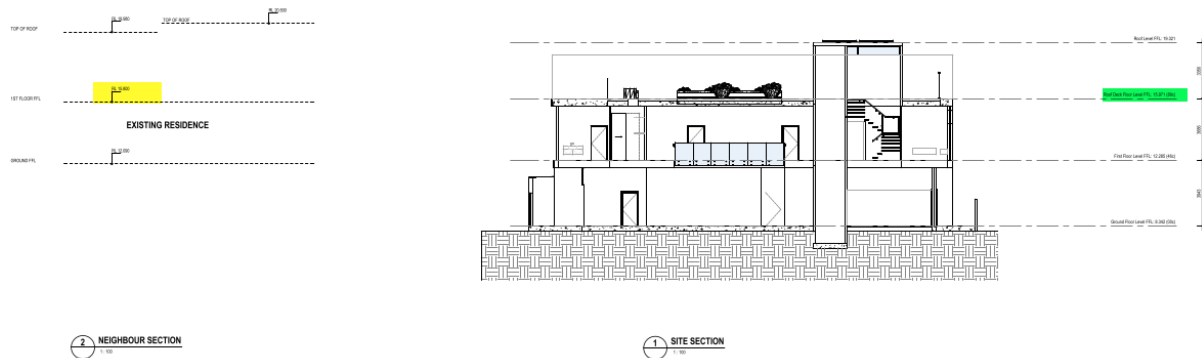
Cross-Section – No. 26 Strome Road (Yellow) No. 23 Carron Road (Green)
